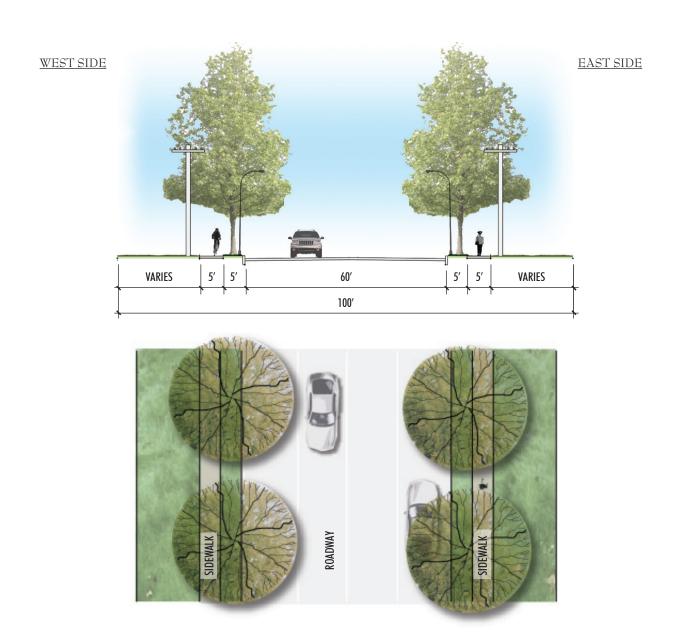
The Hub: Zone 6 Existing Conditions Section and Plan
